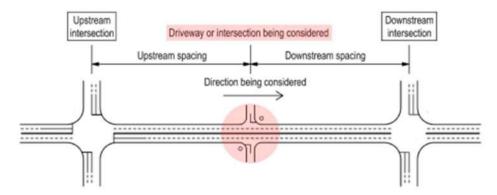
Intersection spacing definitions used (AMG, 2020)
